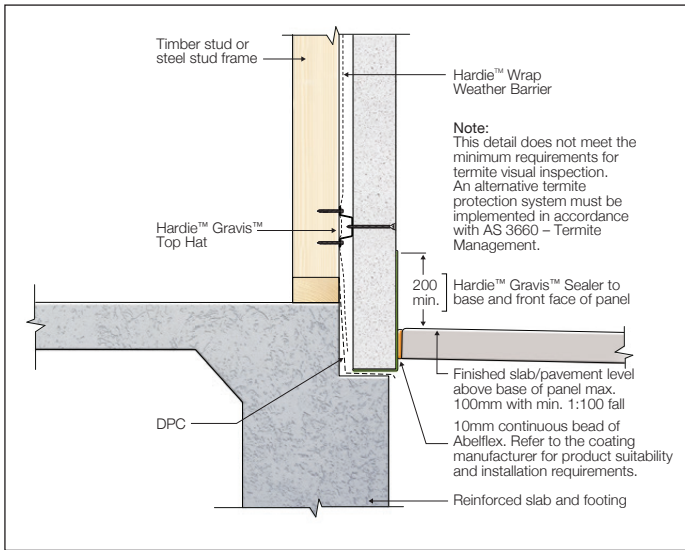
JUNCTION TO HARDIE™ GRAVIS™ PANEL BELOW PAVEMENT SLAB
